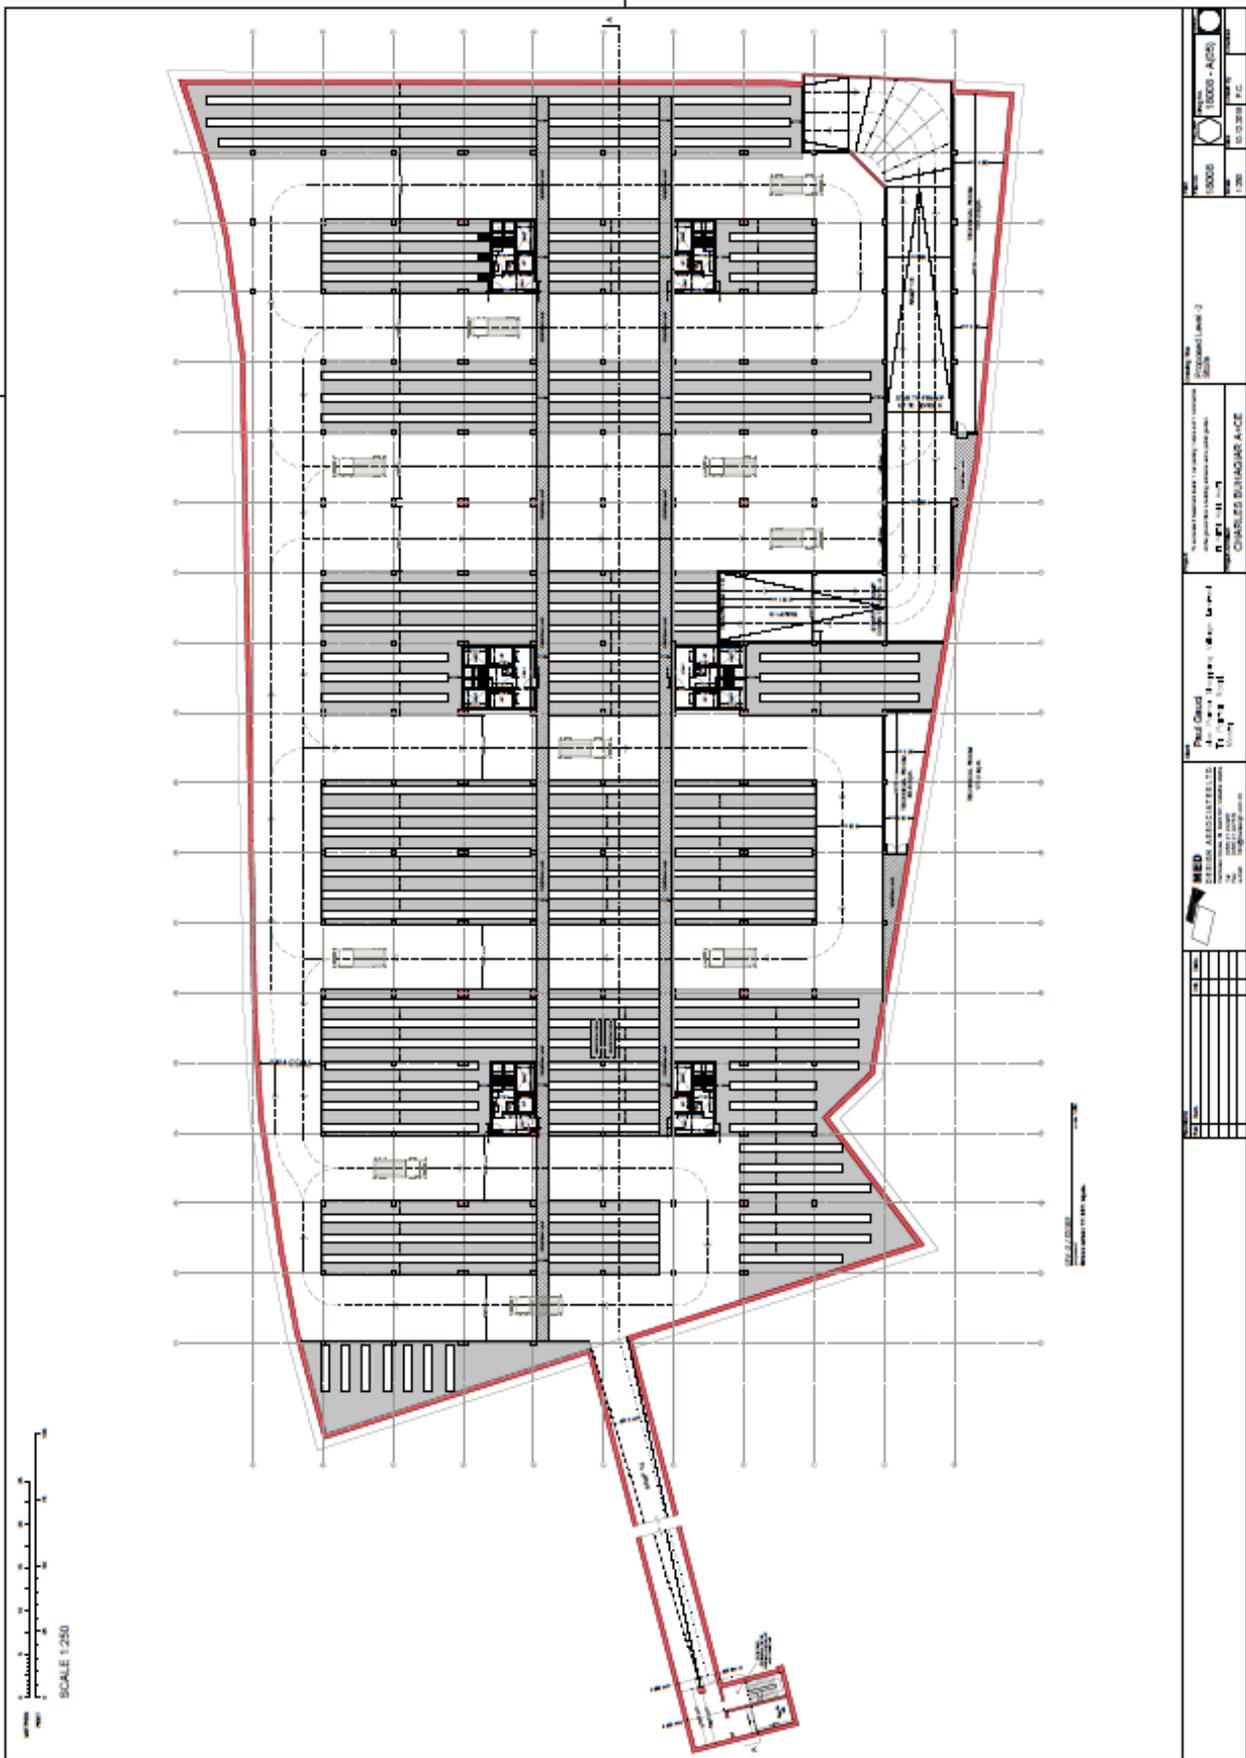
Level -2 Warehouse Floor Plan. (not to scale).
